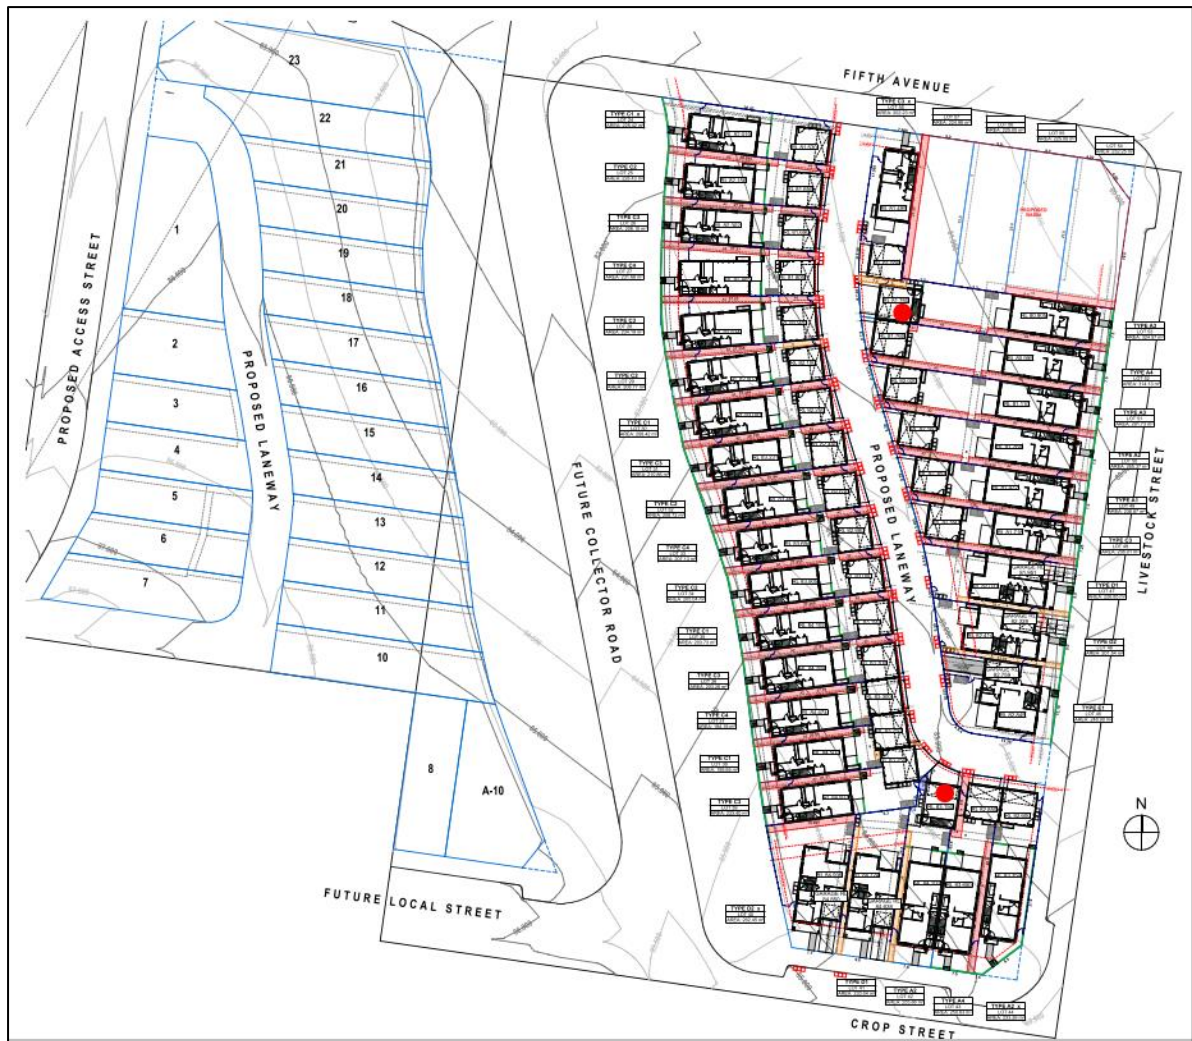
Stage 1 – Ground Floor Plans - Eastern Allotment (Source: Creation Homes)
